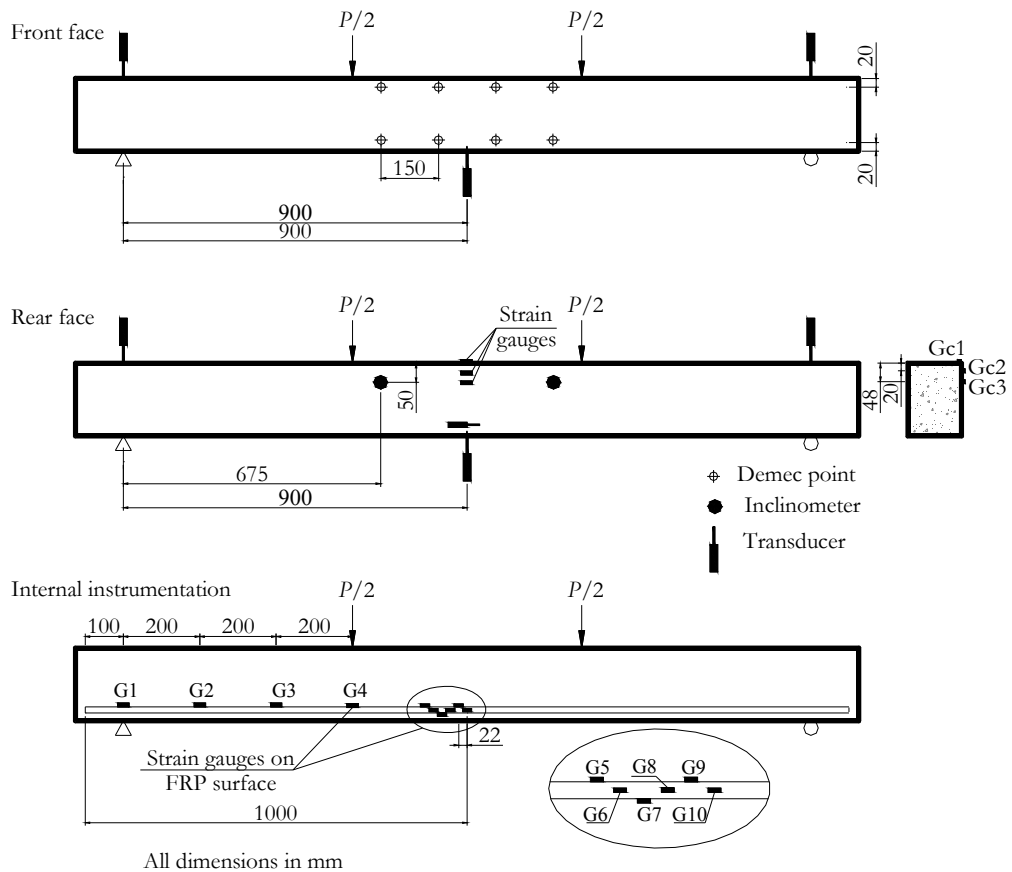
Instrumentation details for beam C2-316-D1-B.
